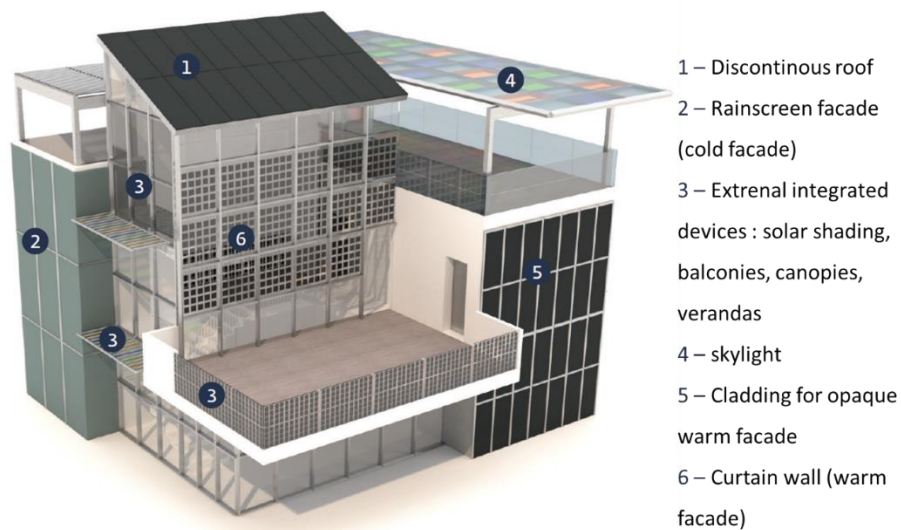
Examples of BIPV application system in Building, [Source: SUPSI \(Zanetti et al., 2020\)](#)
